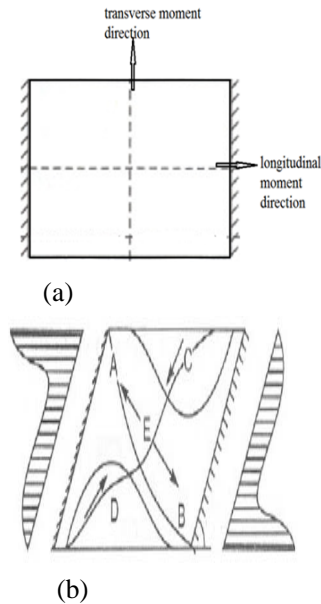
Direction of moment flow in straight and skewed bridge decks.
